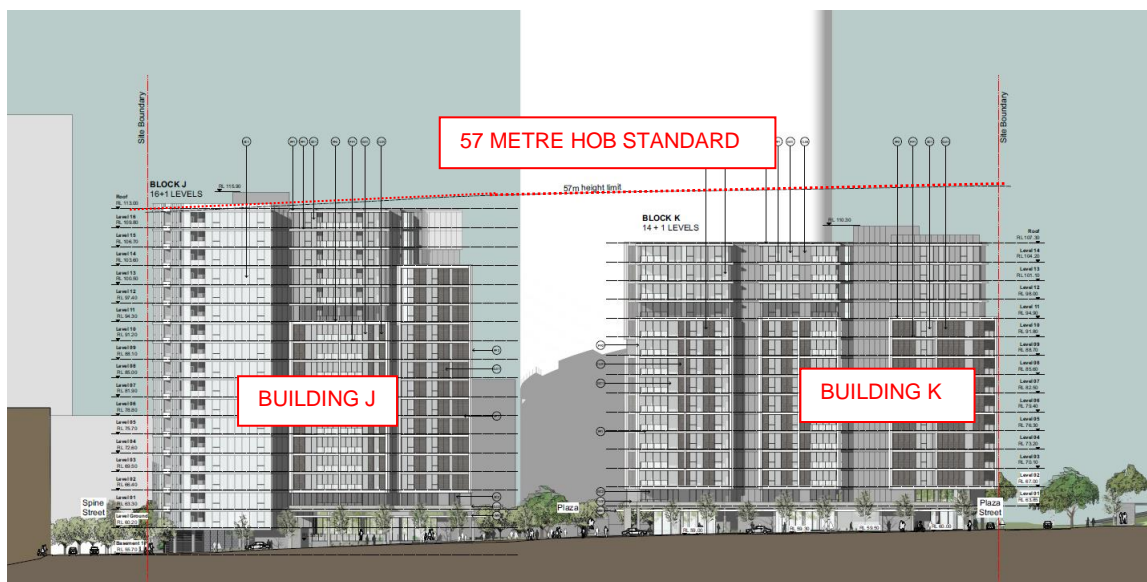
Amended DA West Elevation with reduction in the heights of Buildings J and K on Lot 105 (Jarvis Circuit)
